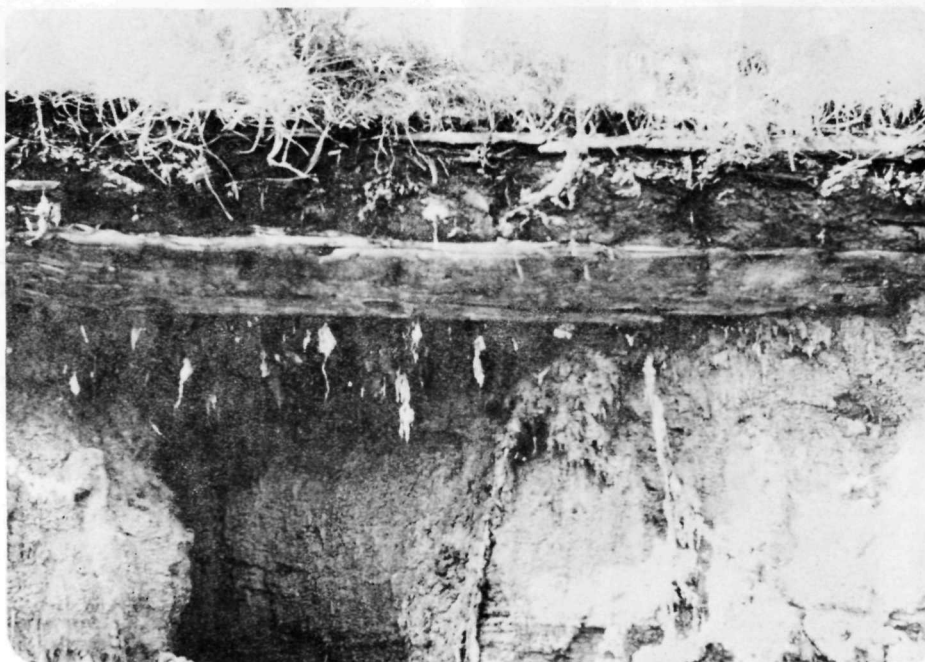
Collapsing section of boardwalk, looking west (Photo by J. Hamilton).
